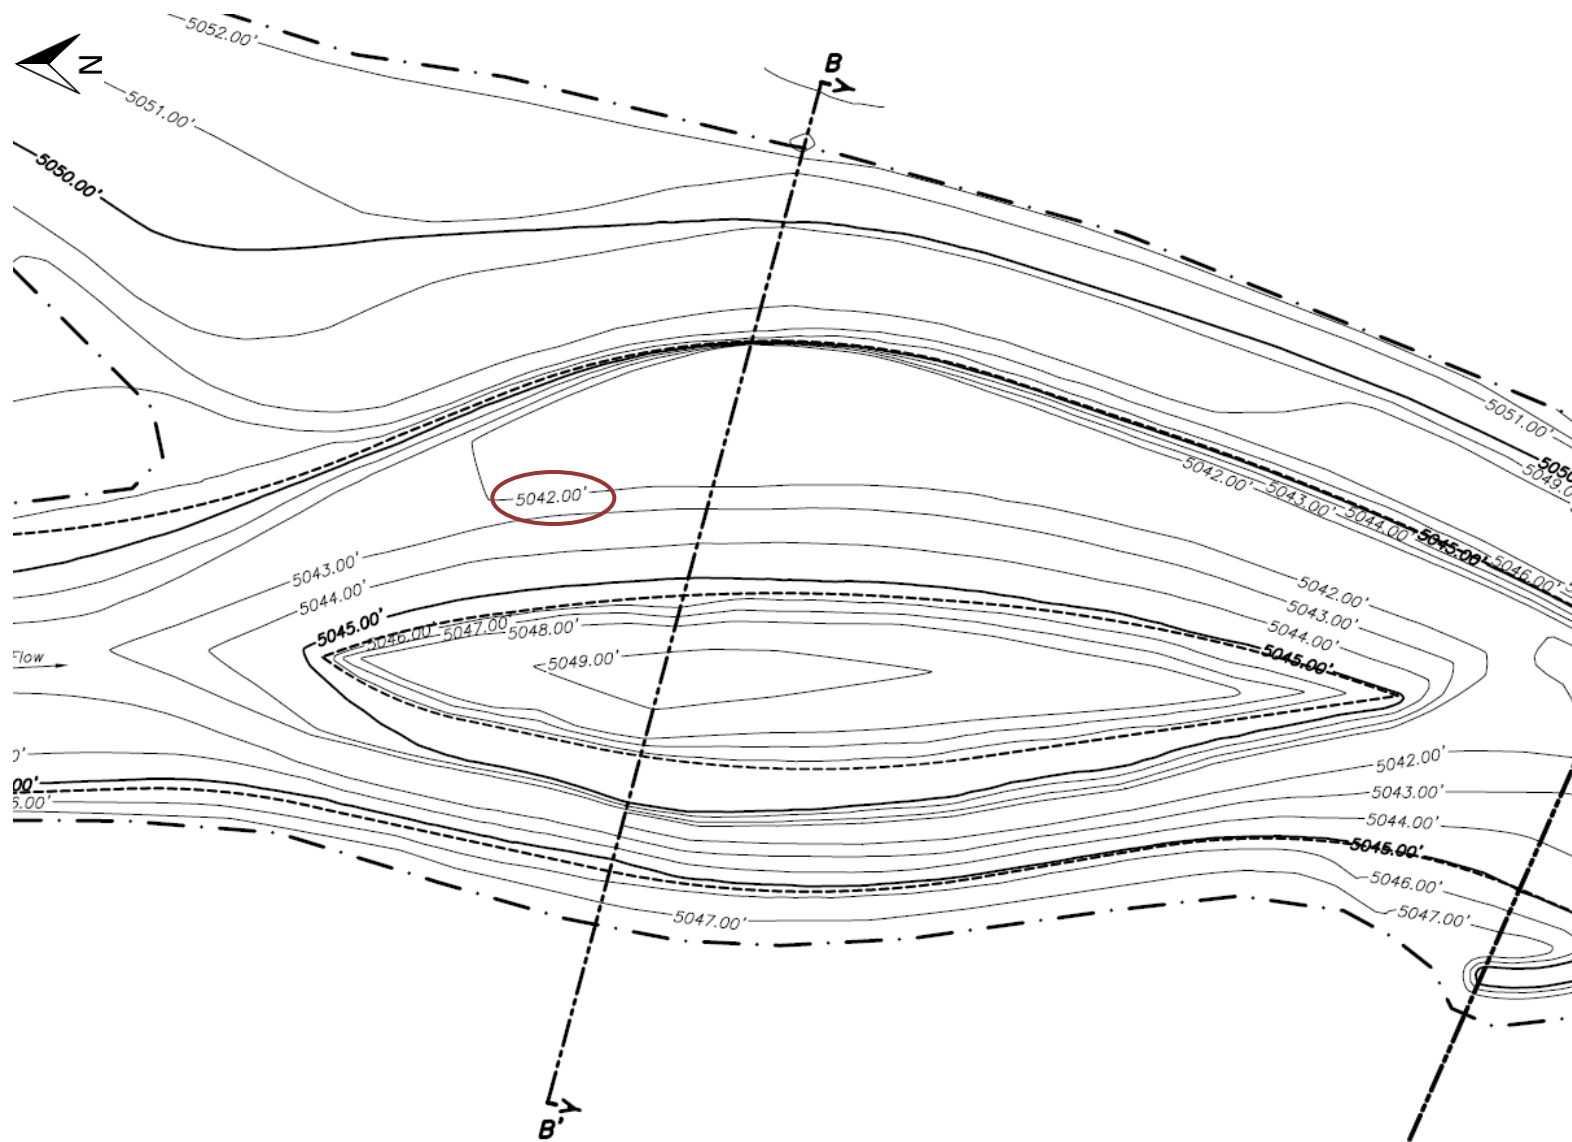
Final grading plan (adapted from BIO-WEST (2006))
